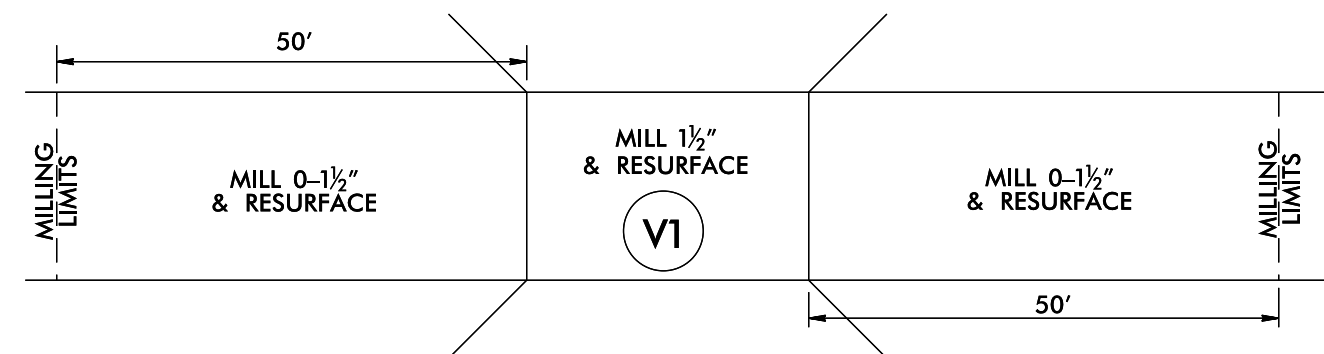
DETAILS OF PATCHING EXISTING PAVEMENT PRIOR TO RESURFACING
